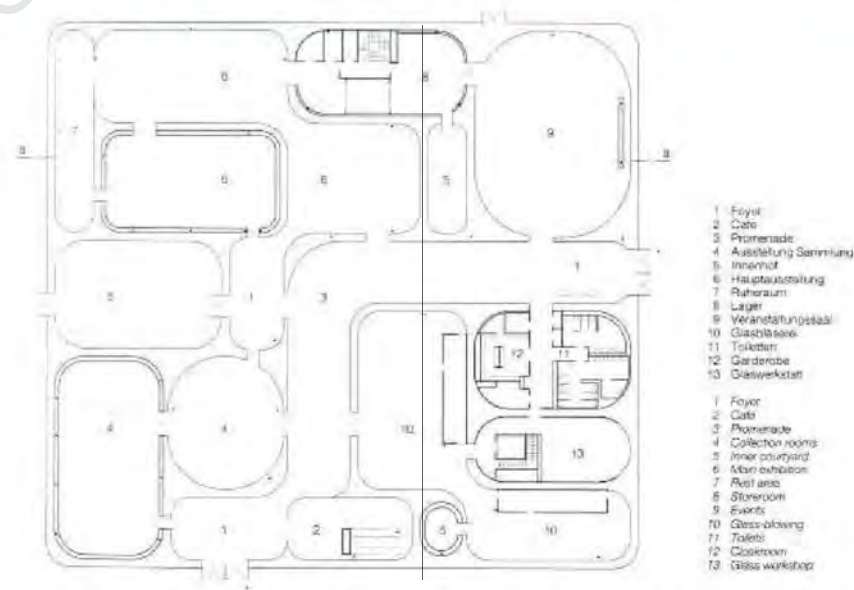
Toledo Art Museum Glass pavilion interior views and plans [Detail, 2007:37]
